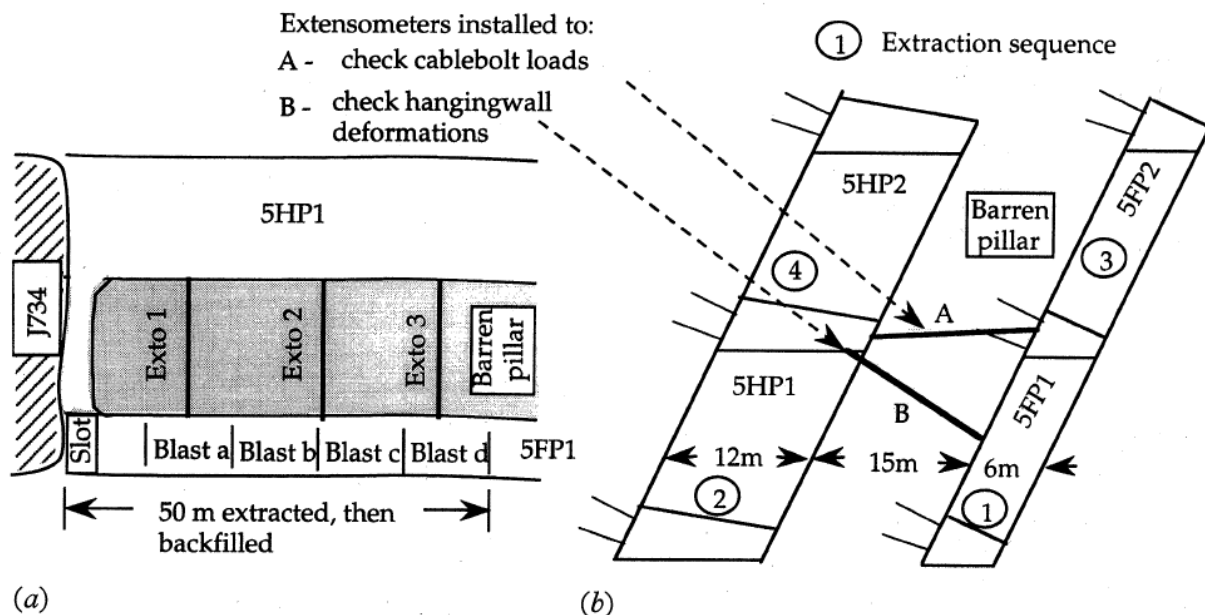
(a) Plan view and (b) cross-section, looking north, of the 5HP1 and 5FP1 stopes showing extensometer locations, ground support, blast sequence (from Villaescusa, 1996).
